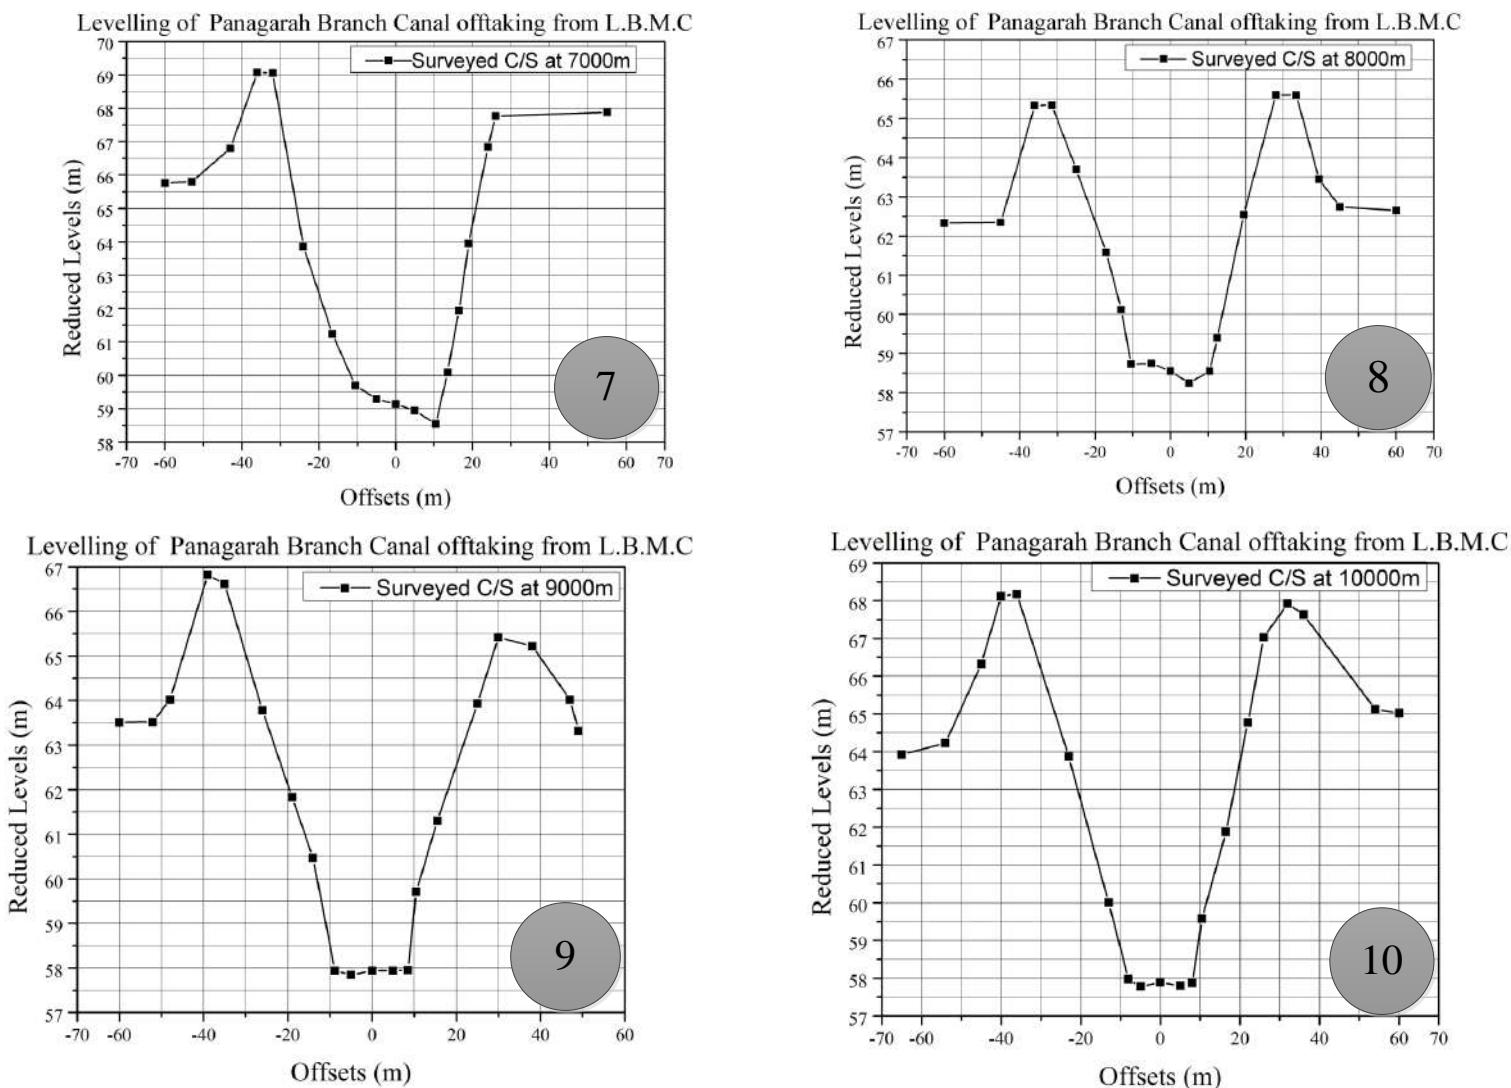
Canal cross section from 7 km to 10 km on Panagarh branch canal
